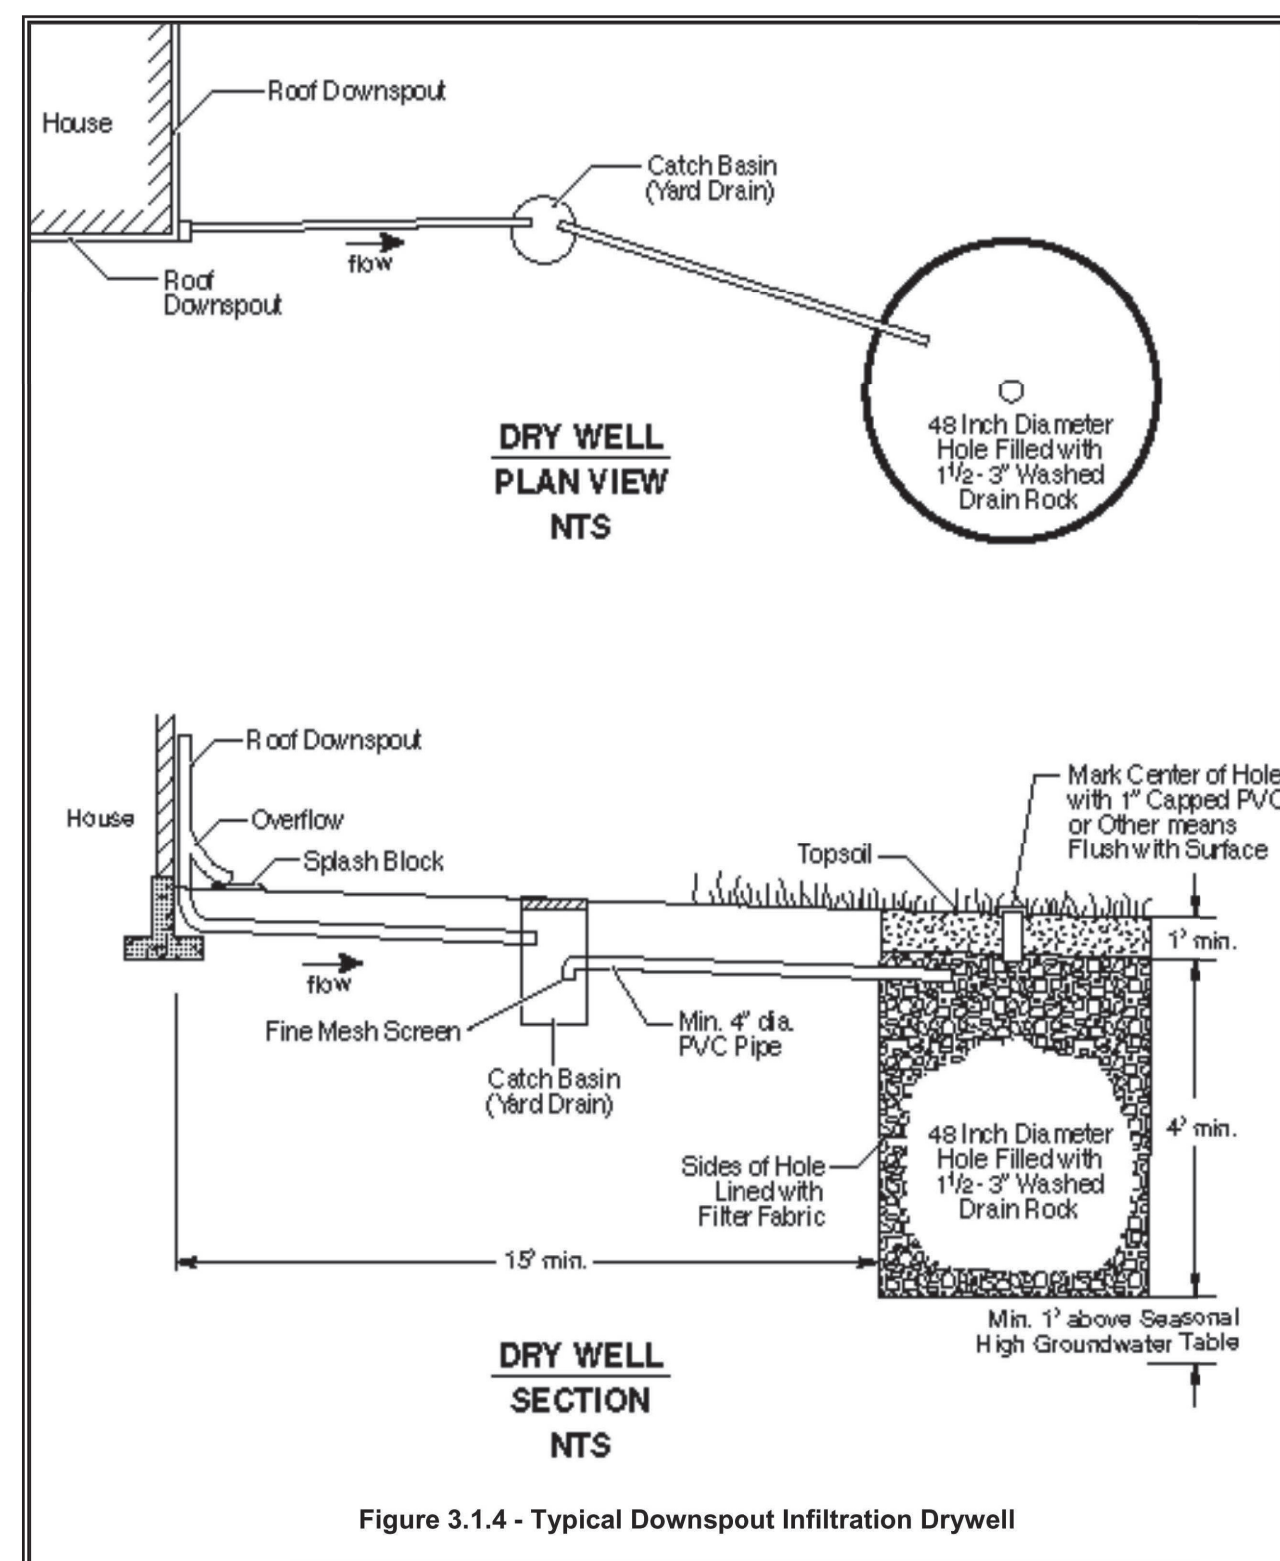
Typical Downspout Infiltration Drywell
